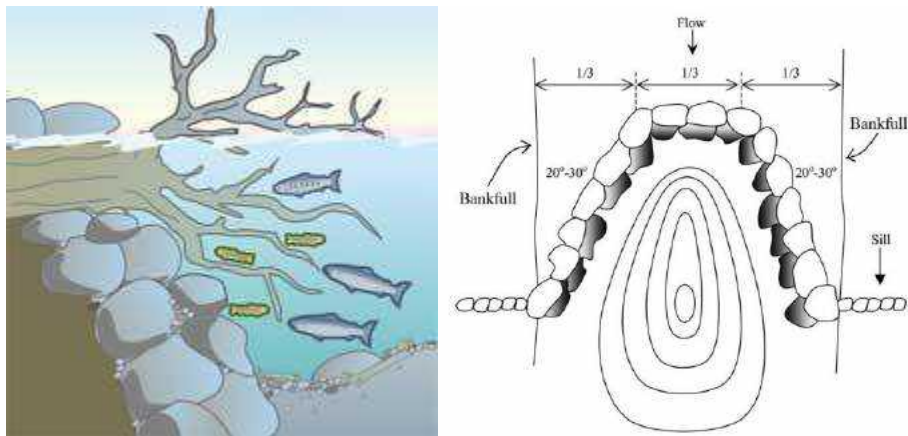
Large Woody Debris detail (from King County website) and Rock Vane detail (Rosgen).
